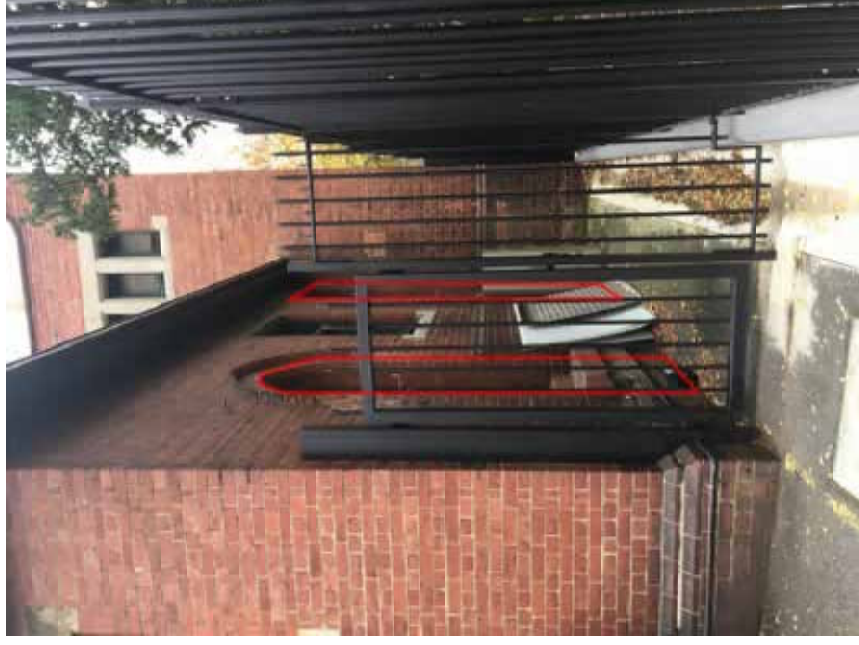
Proposed reconfiguration of the existing openings to the south façade of the main kitchen. As the internal FFLs will be lowered, the existing openings will require to be lowered.
